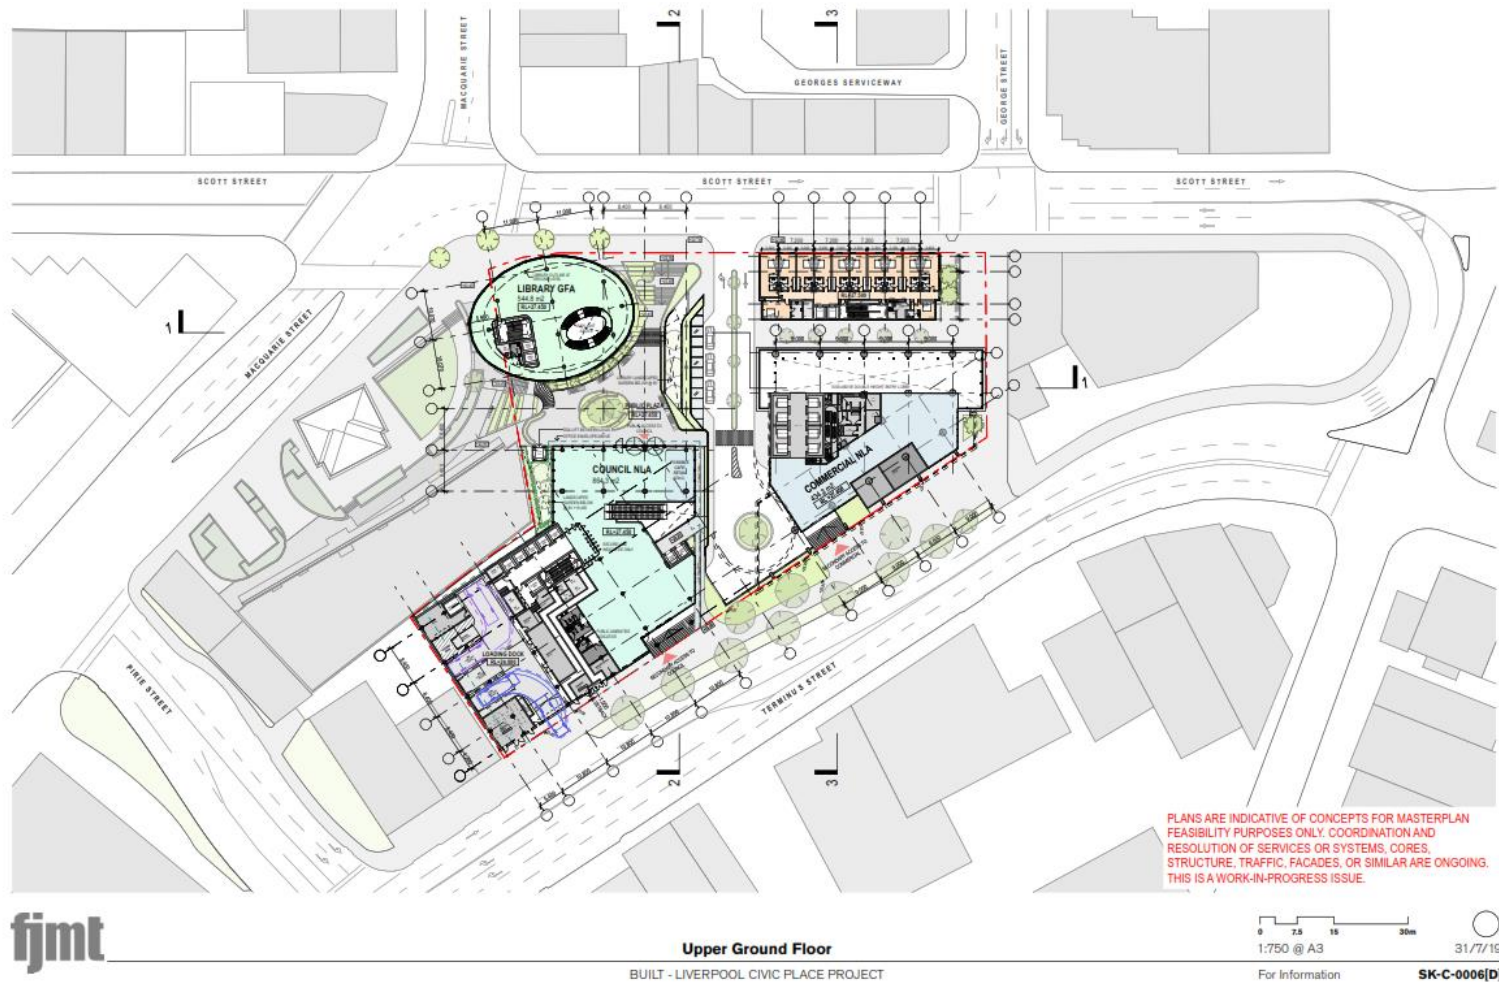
Upper ground floor plan of the proposed development at the study area (Source: Built).
